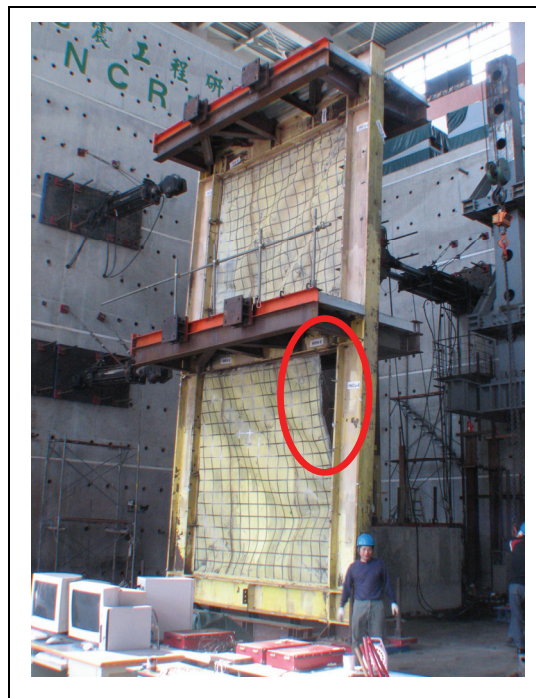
Fracture of the welds connecting the infill panels to fish plates
